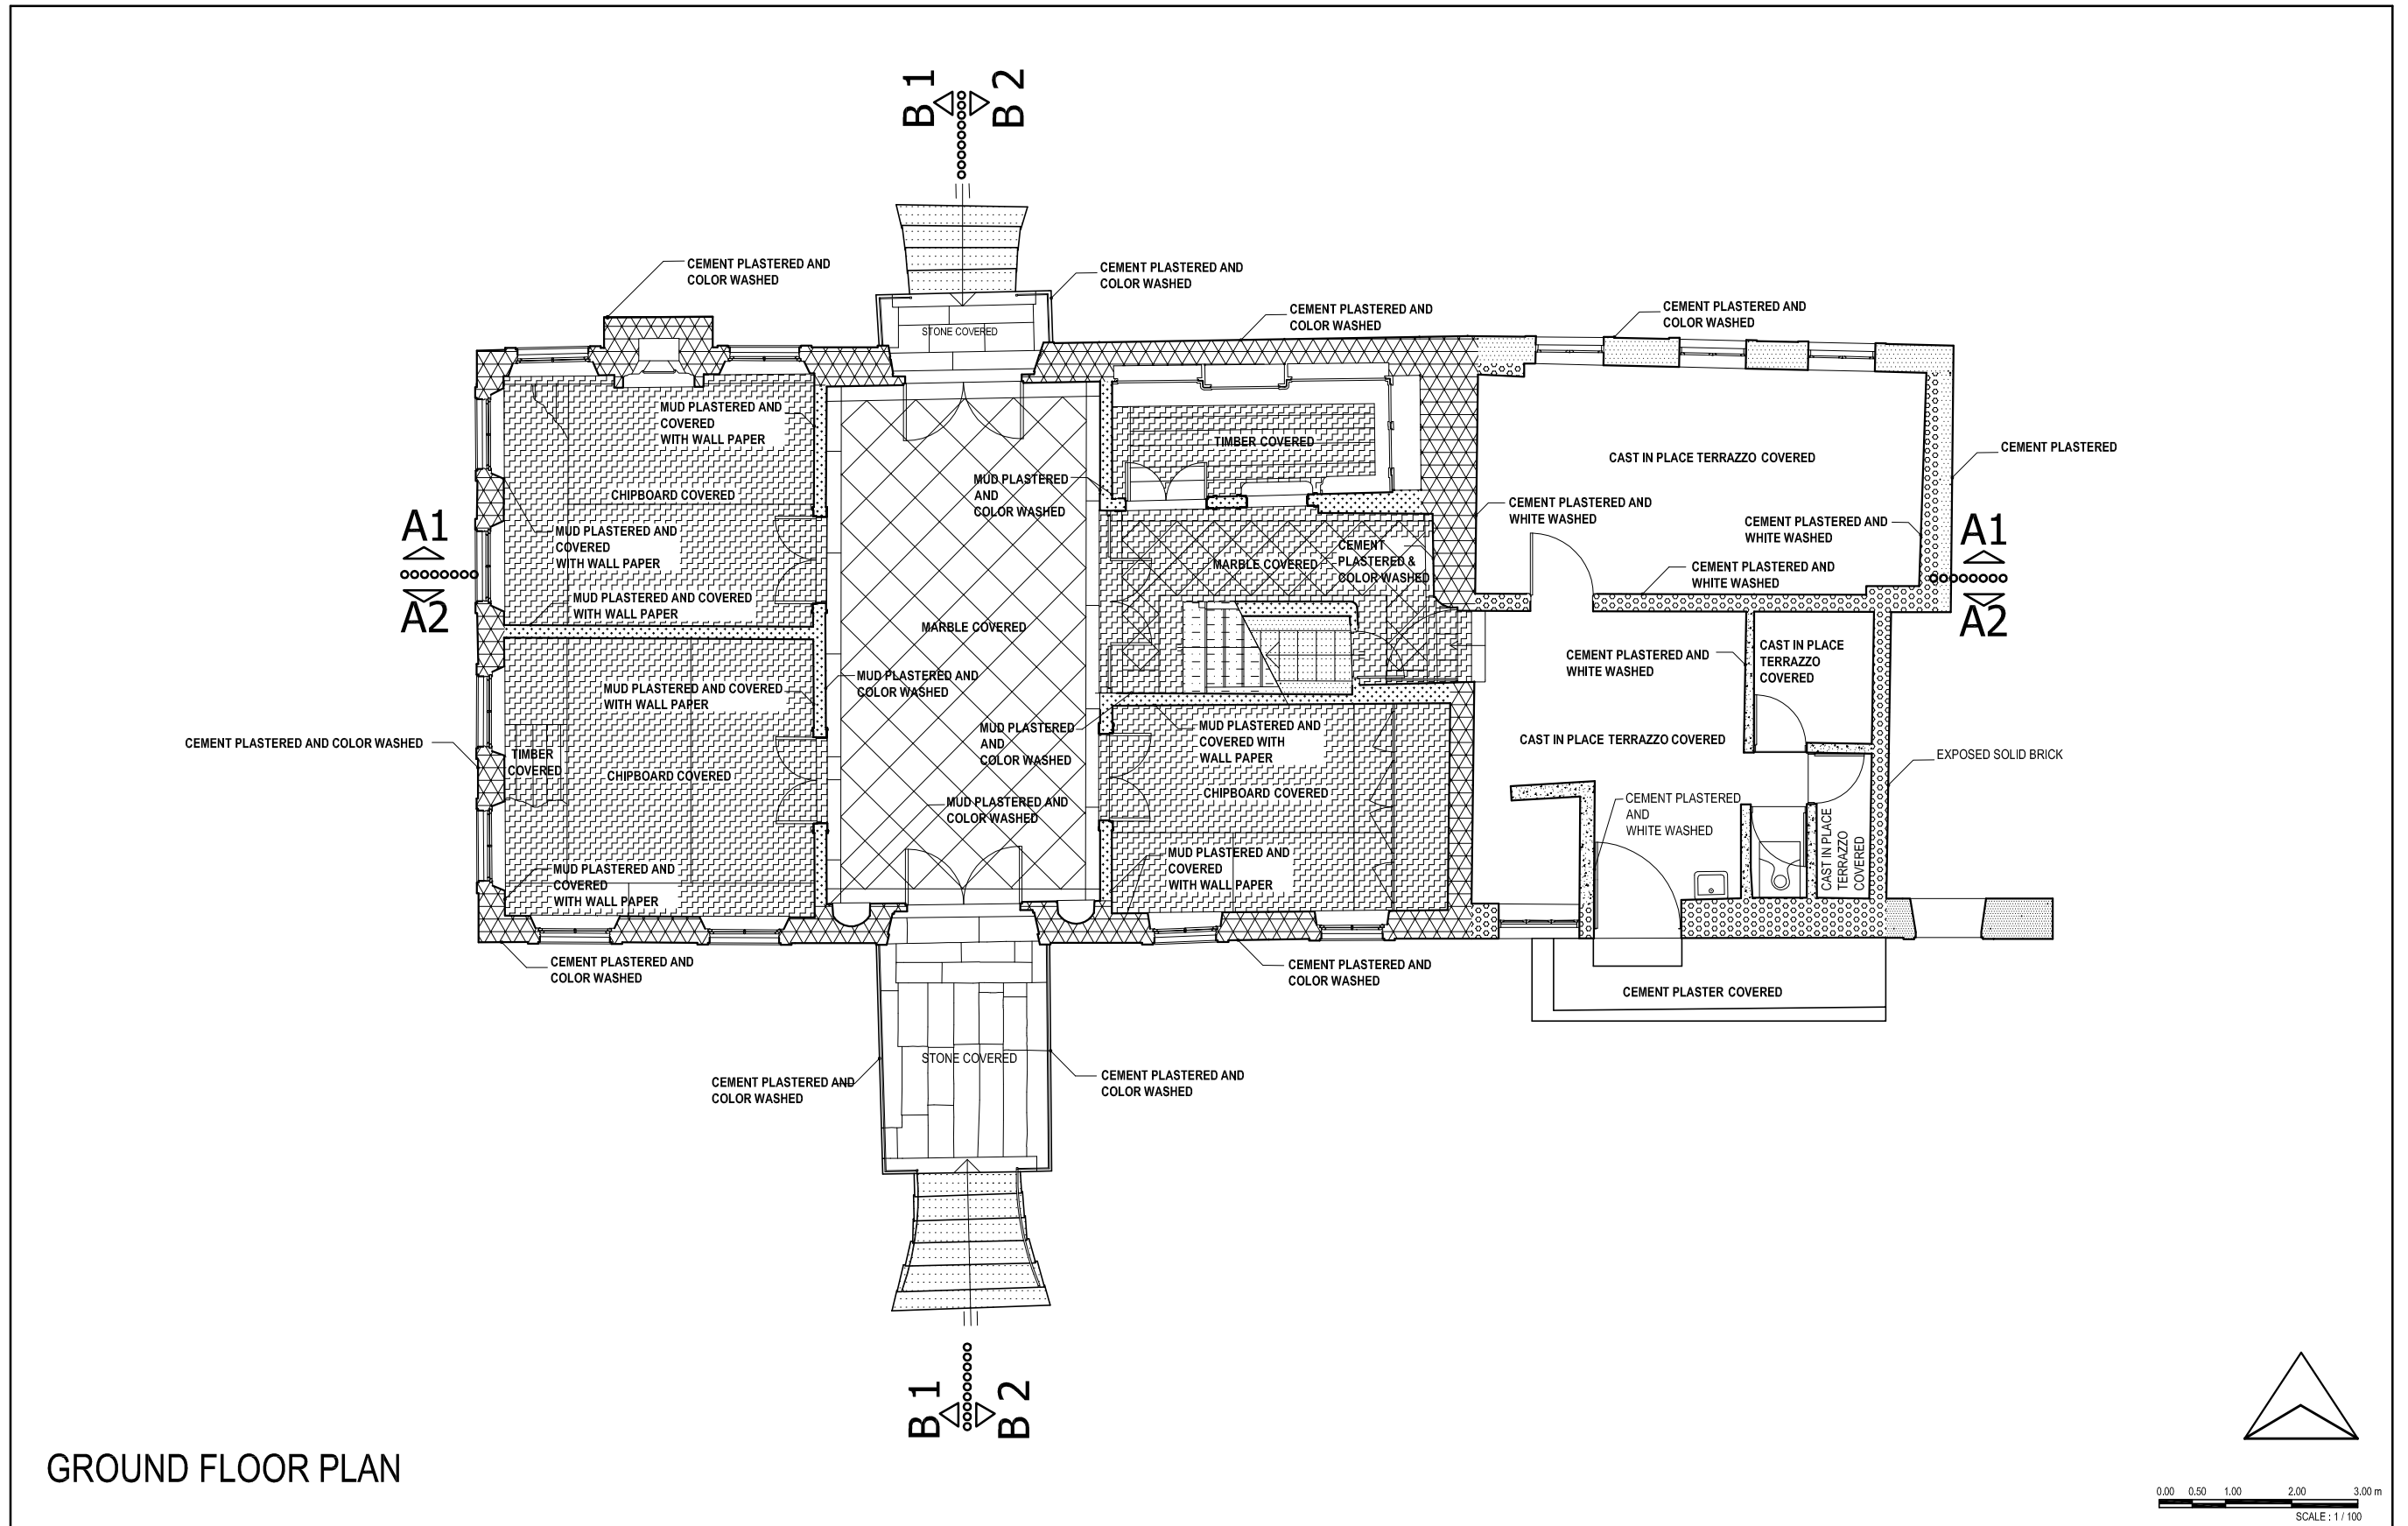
Analysis of Structural Characteristics- Ground Floor Plan
